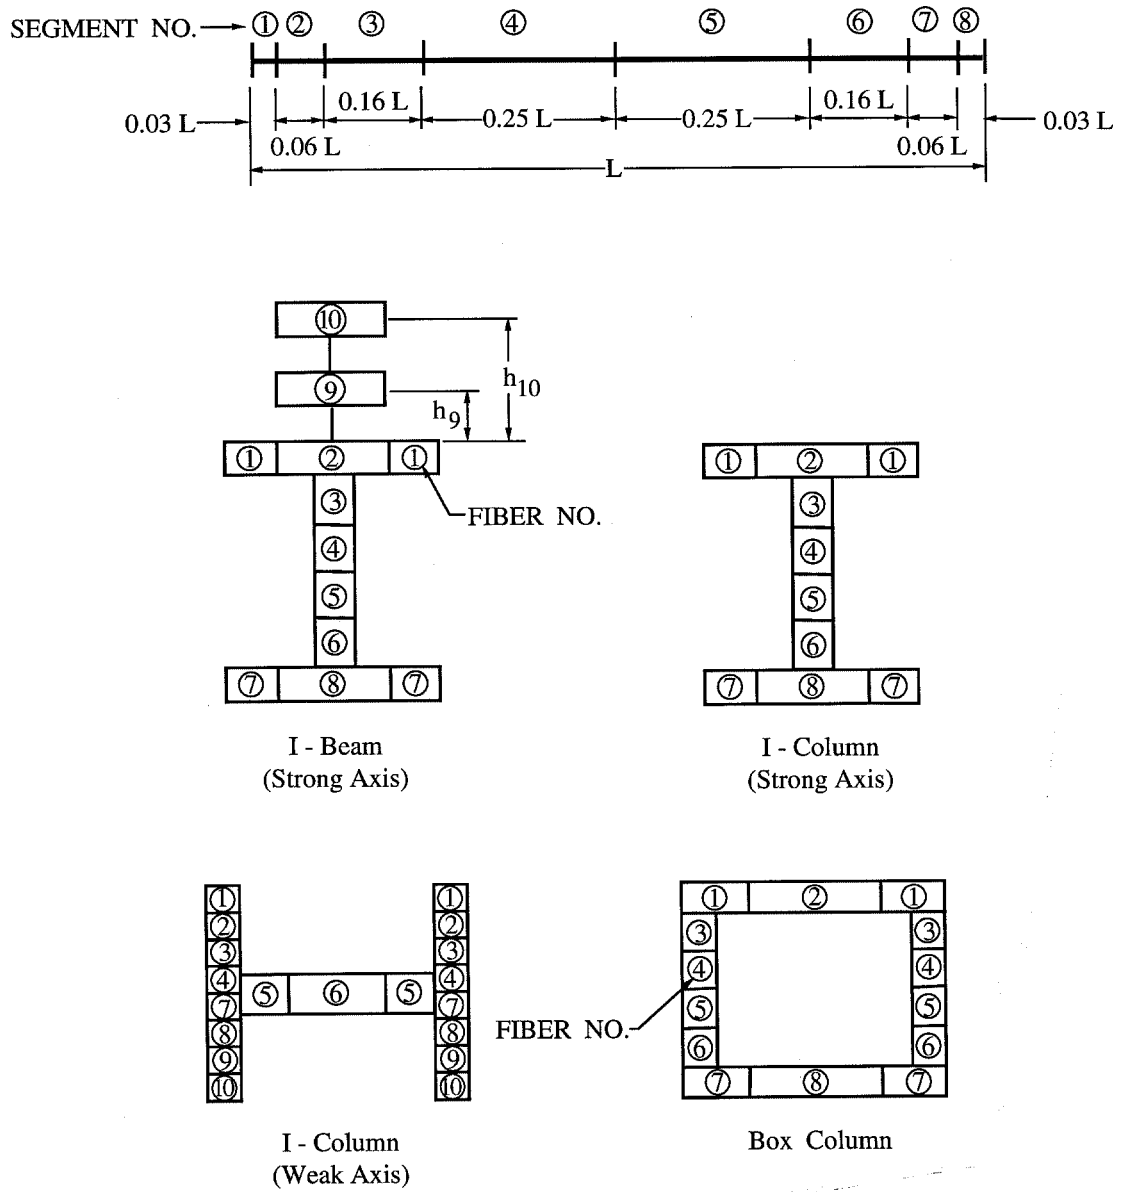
The finite element models of the four building designs use the fiber method. Each beam and column element is subdivided into eight segments on the length and into eight or ten fibers on the cross section. Fibers 1–8 represent the steel beam or column. Fibers 9 and 10 represent a deck-slab floor system. Reproduced from Hall (1997).
